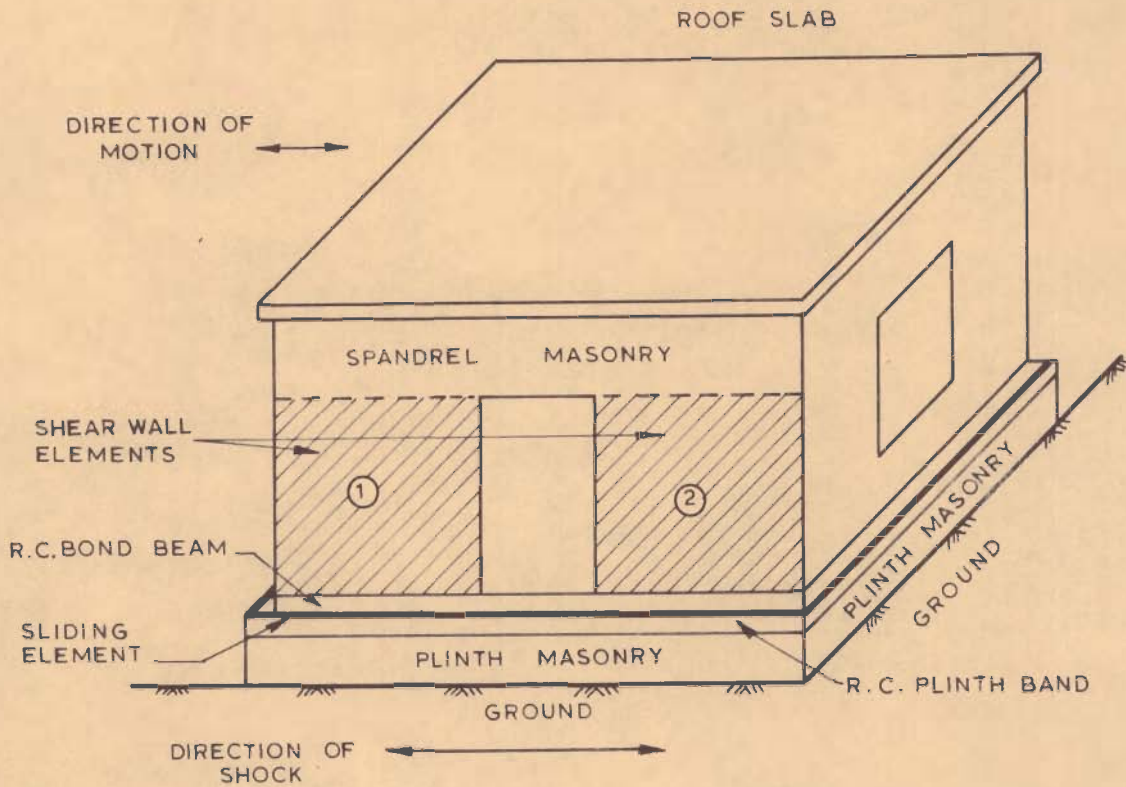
\_IDEALIZED SLIDING TYPE BRICK BUILDING
